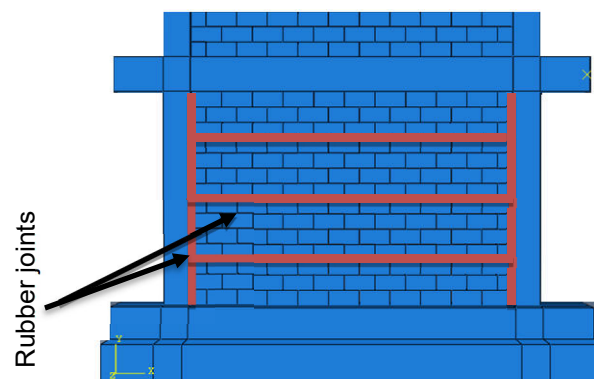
Masonry infilled walls with horizontal and vertical rubber joints.
